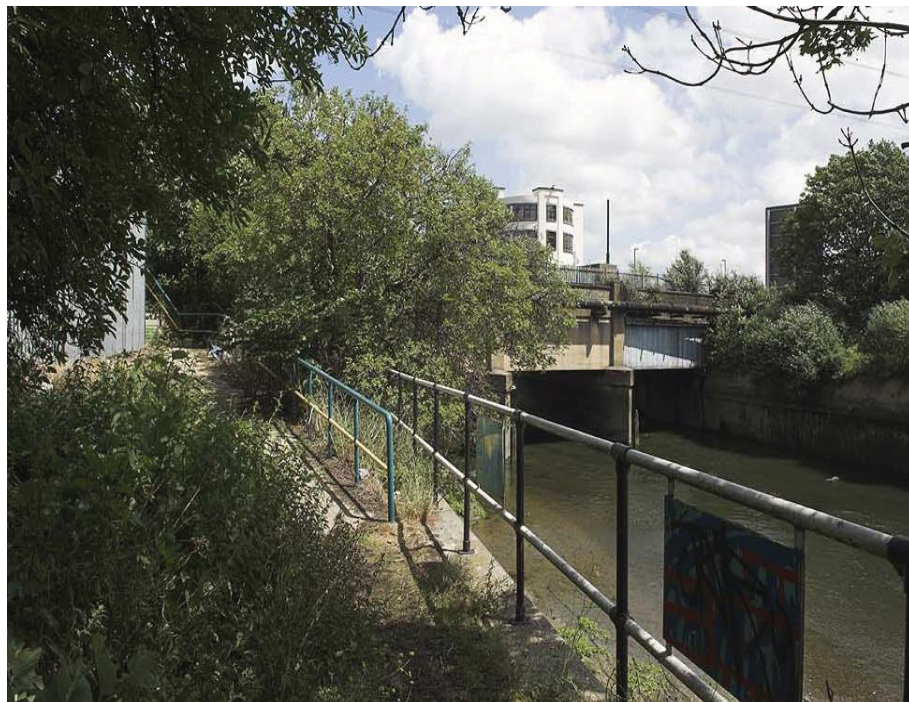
View of access point 4 ramp and Waterworks River towpath on south embankment looking north
